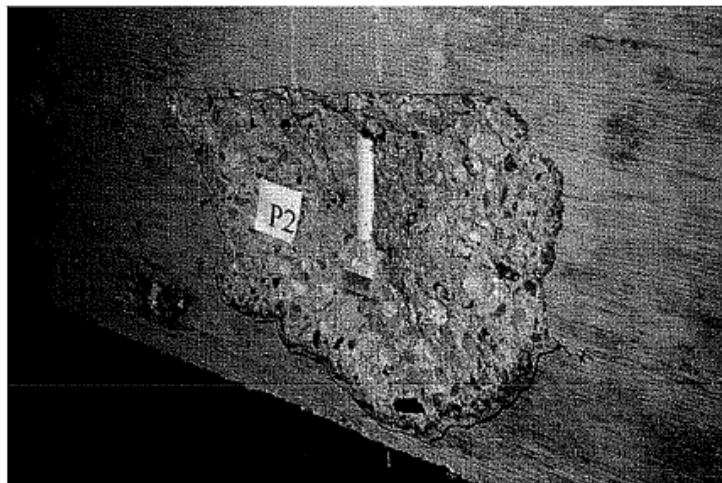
Side-blowout failure in a beam-to-column joint test (Bashandy 1996)
